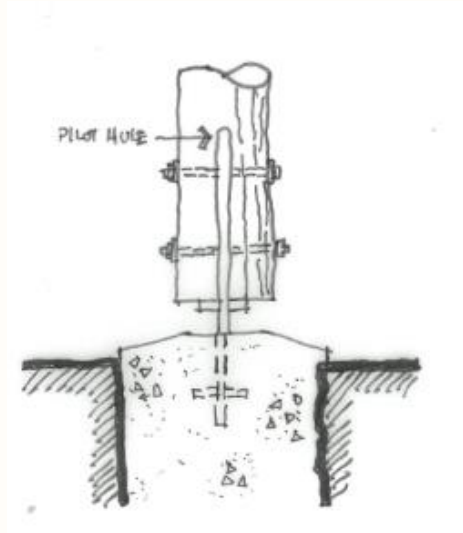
Sketch showing how Gum pole structure connects to ground (Author, 2023)
